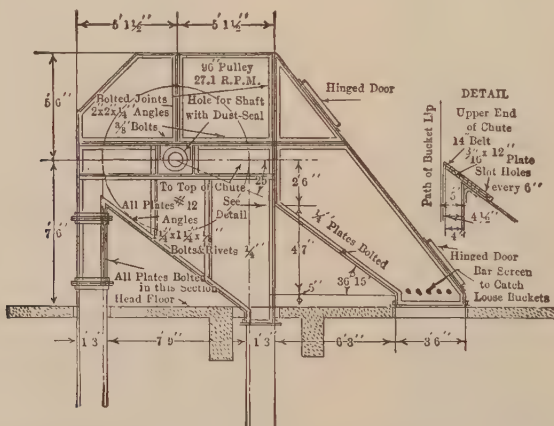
Head of Shipping Elevator, Public Grain Elevator, New Orleans. (Ford, Bacon & Davis, Engineers).
